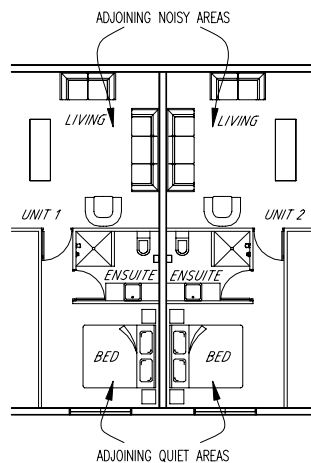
Example of Layout Planning - Good Acoustic Practice
